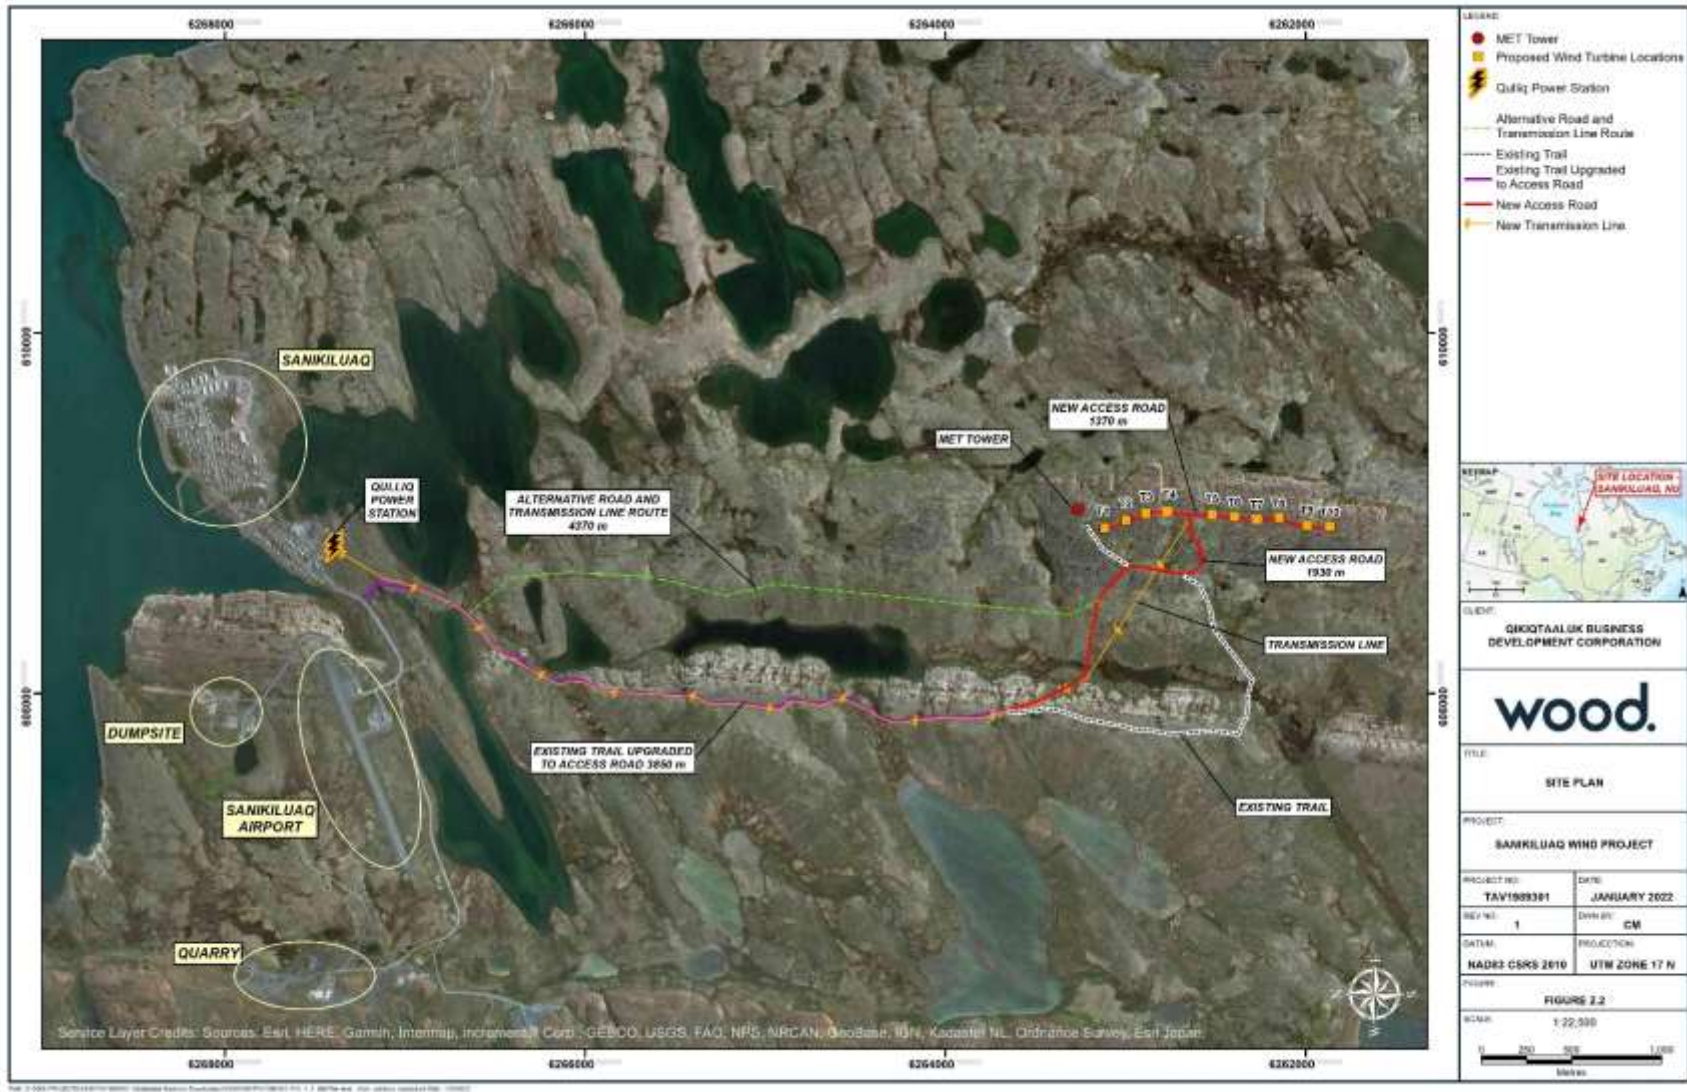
Sanikiluaq Site Plan (Wood 2022, 6).
